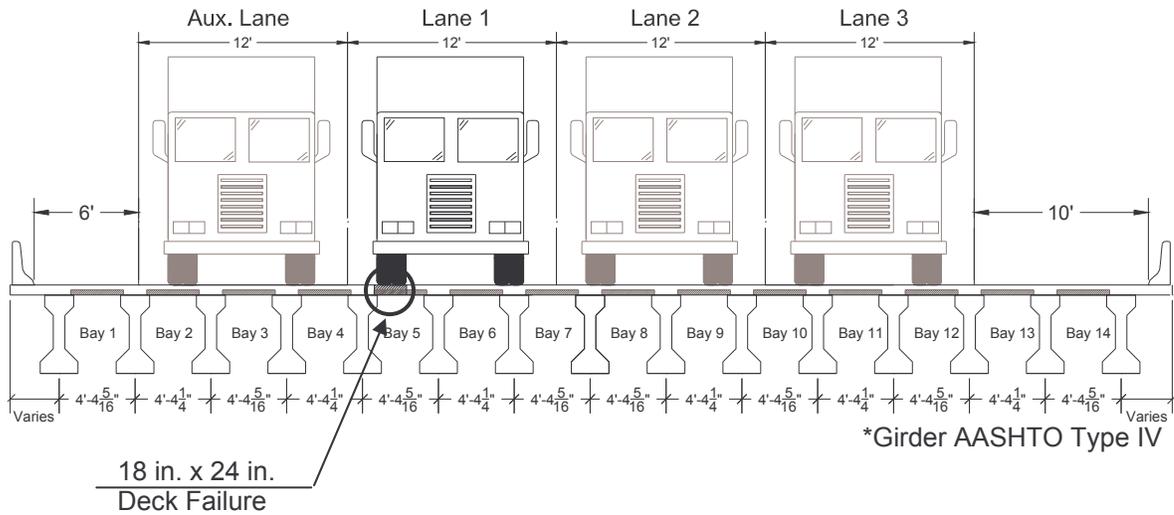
Cross Section View of Bridge #170146 – Main Span
